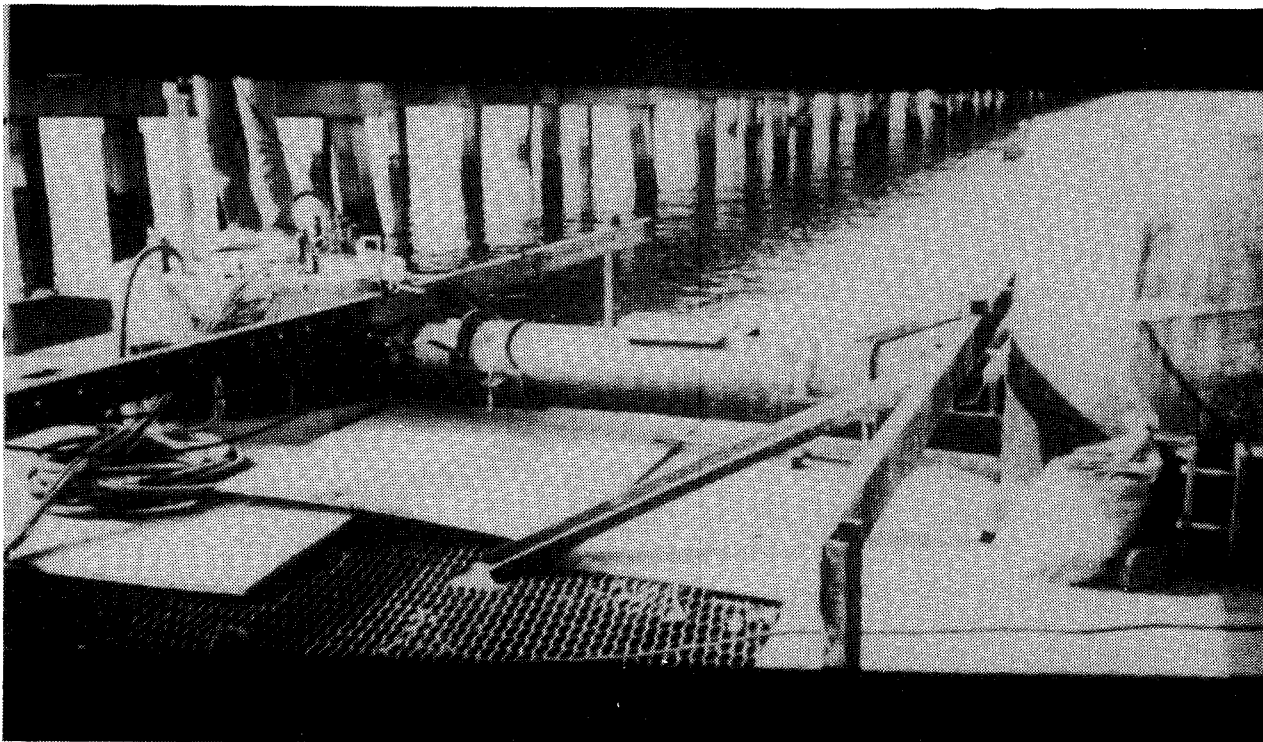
Typical Lateral Load Test Arrangement (courtesy of Florida DOT)
